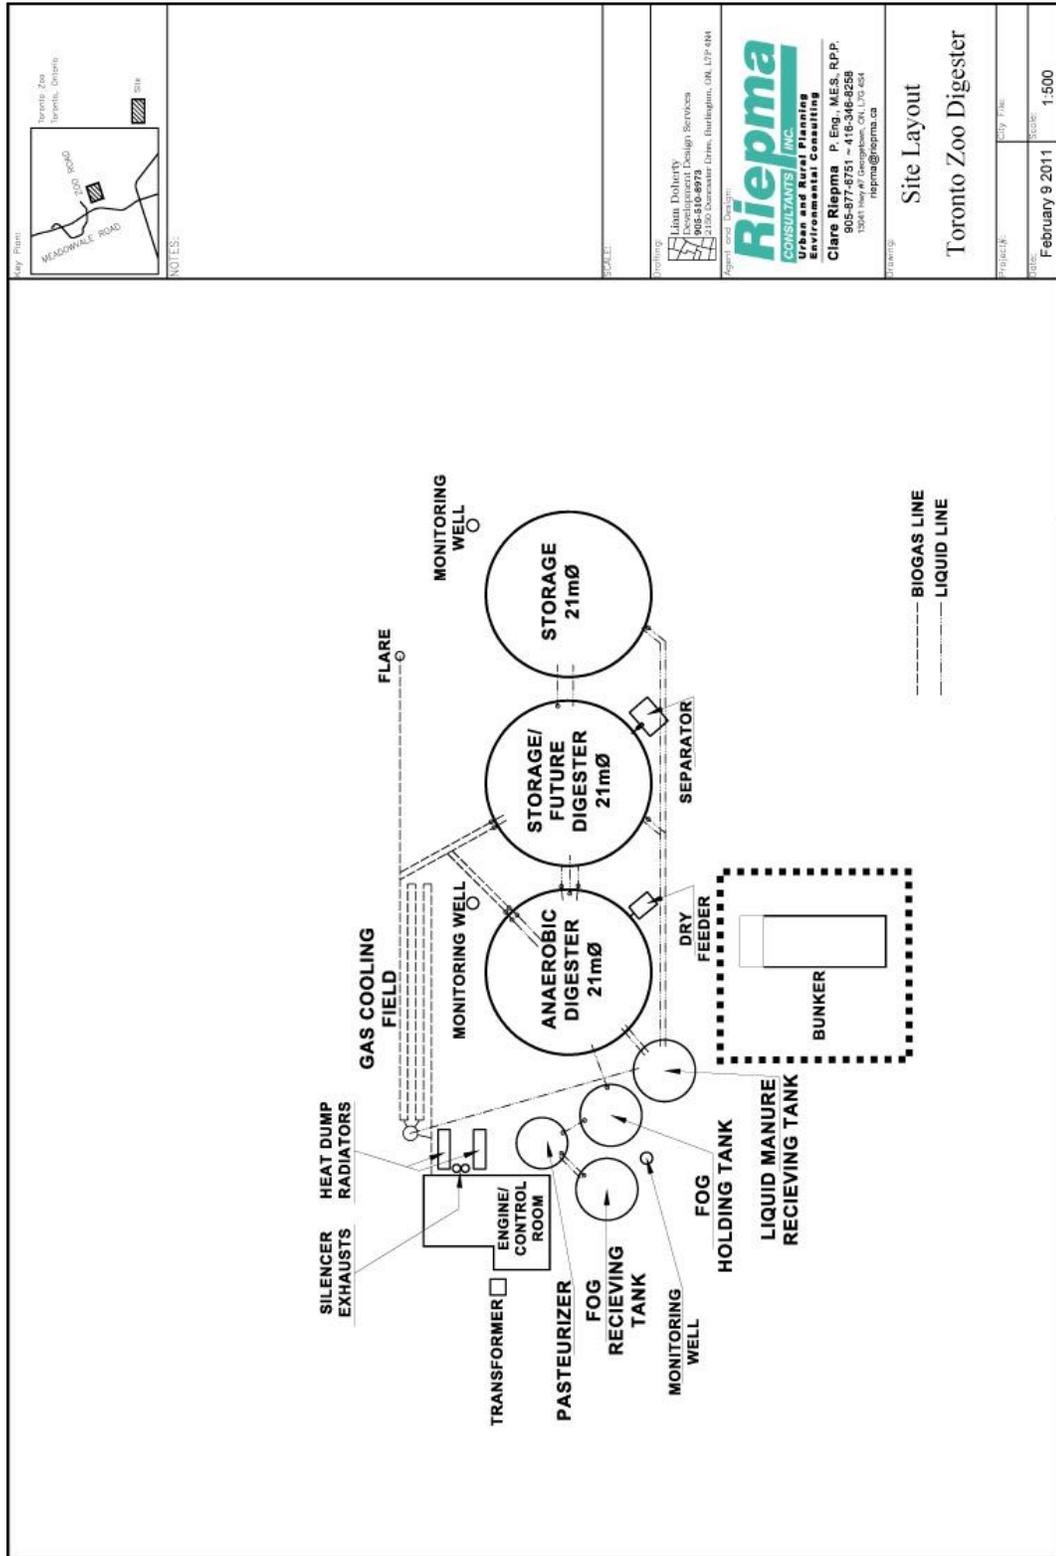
Development Plan, note that the “Bunker” has been removed from the final plan
